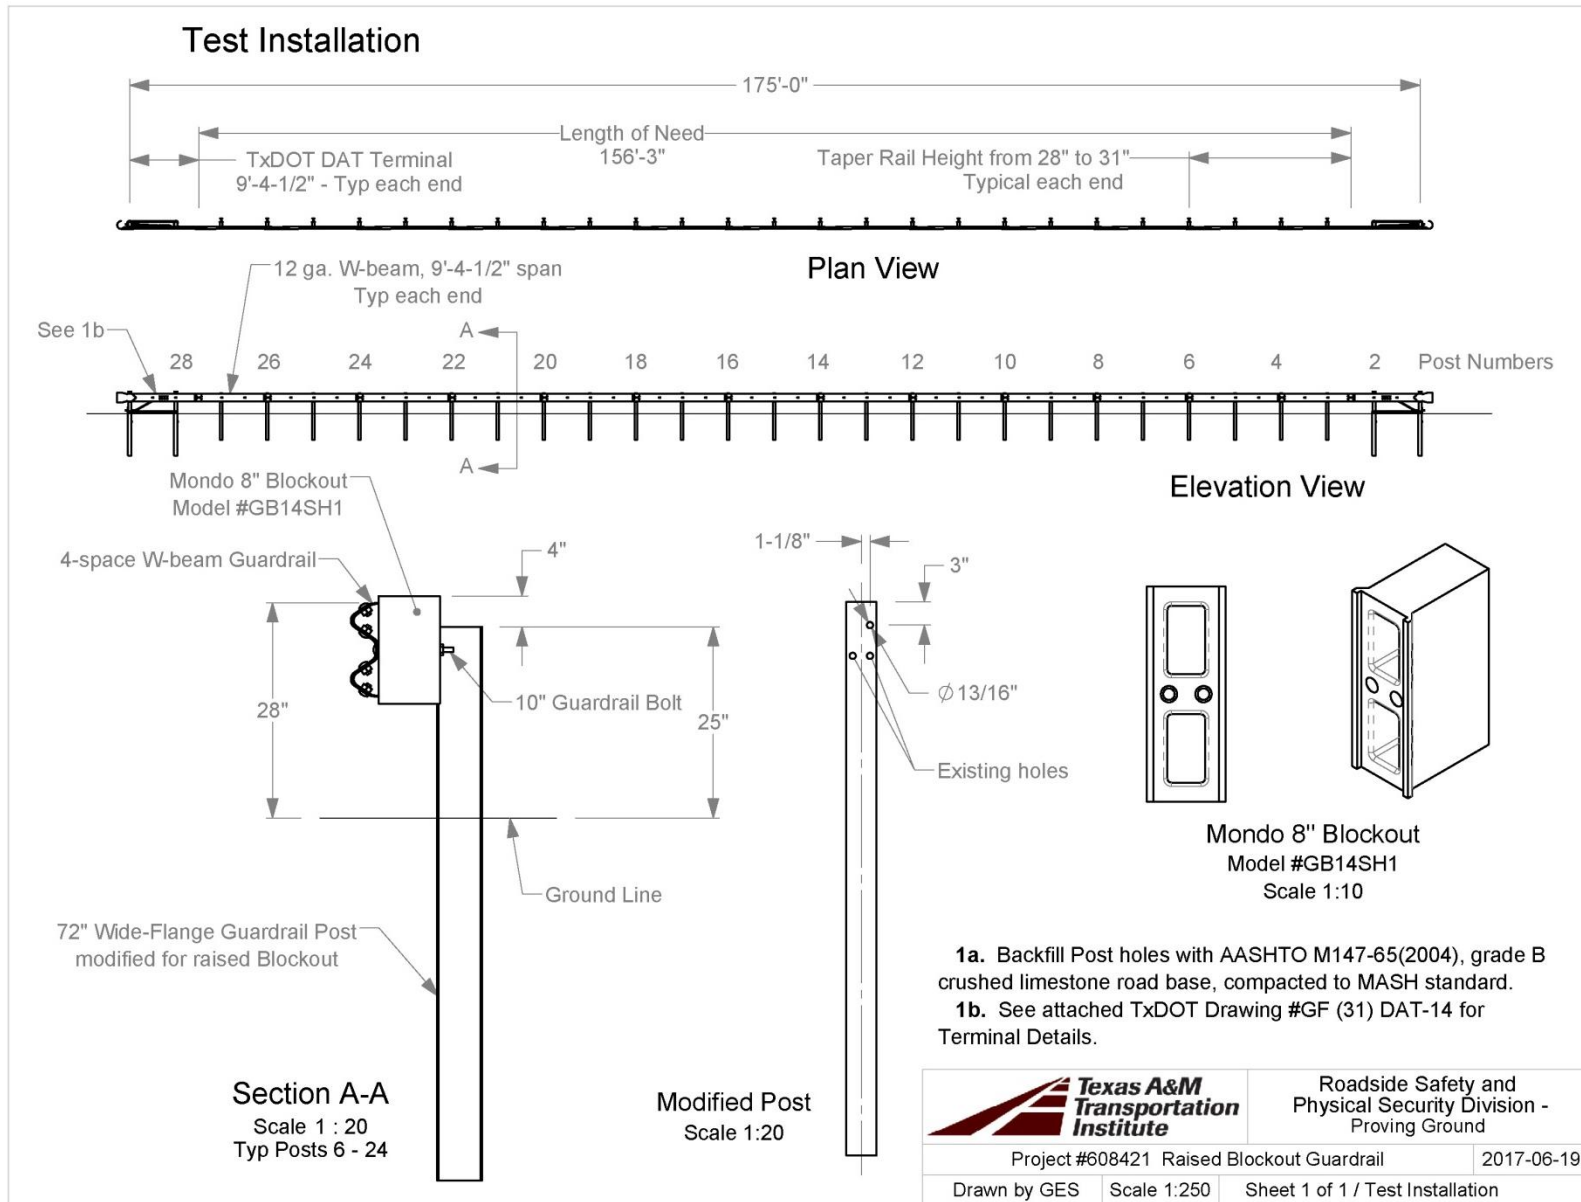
Details of the 28-inch W-Beam Guardrail System with Raised Composite Blockouts.
